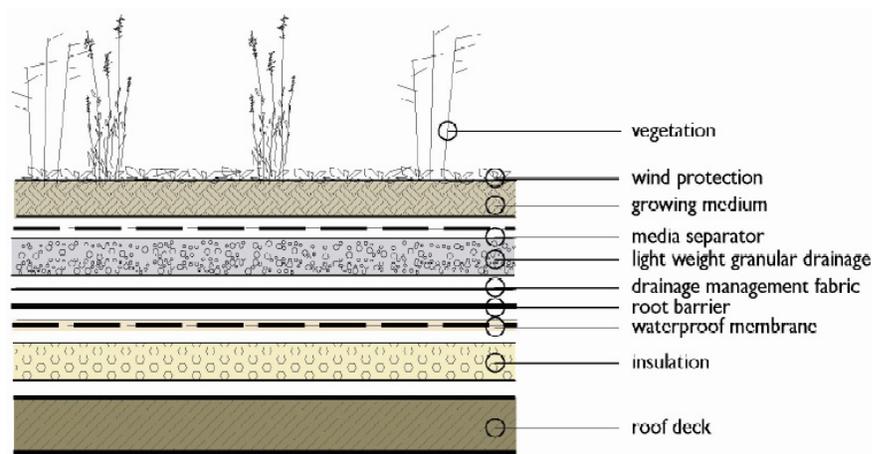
Cross section of a green roof (Dvorak and de la Fleur, 2005). Green roofs are not all alike but typically have the common components of waterproofing, drainage, a growing medium and plants.
